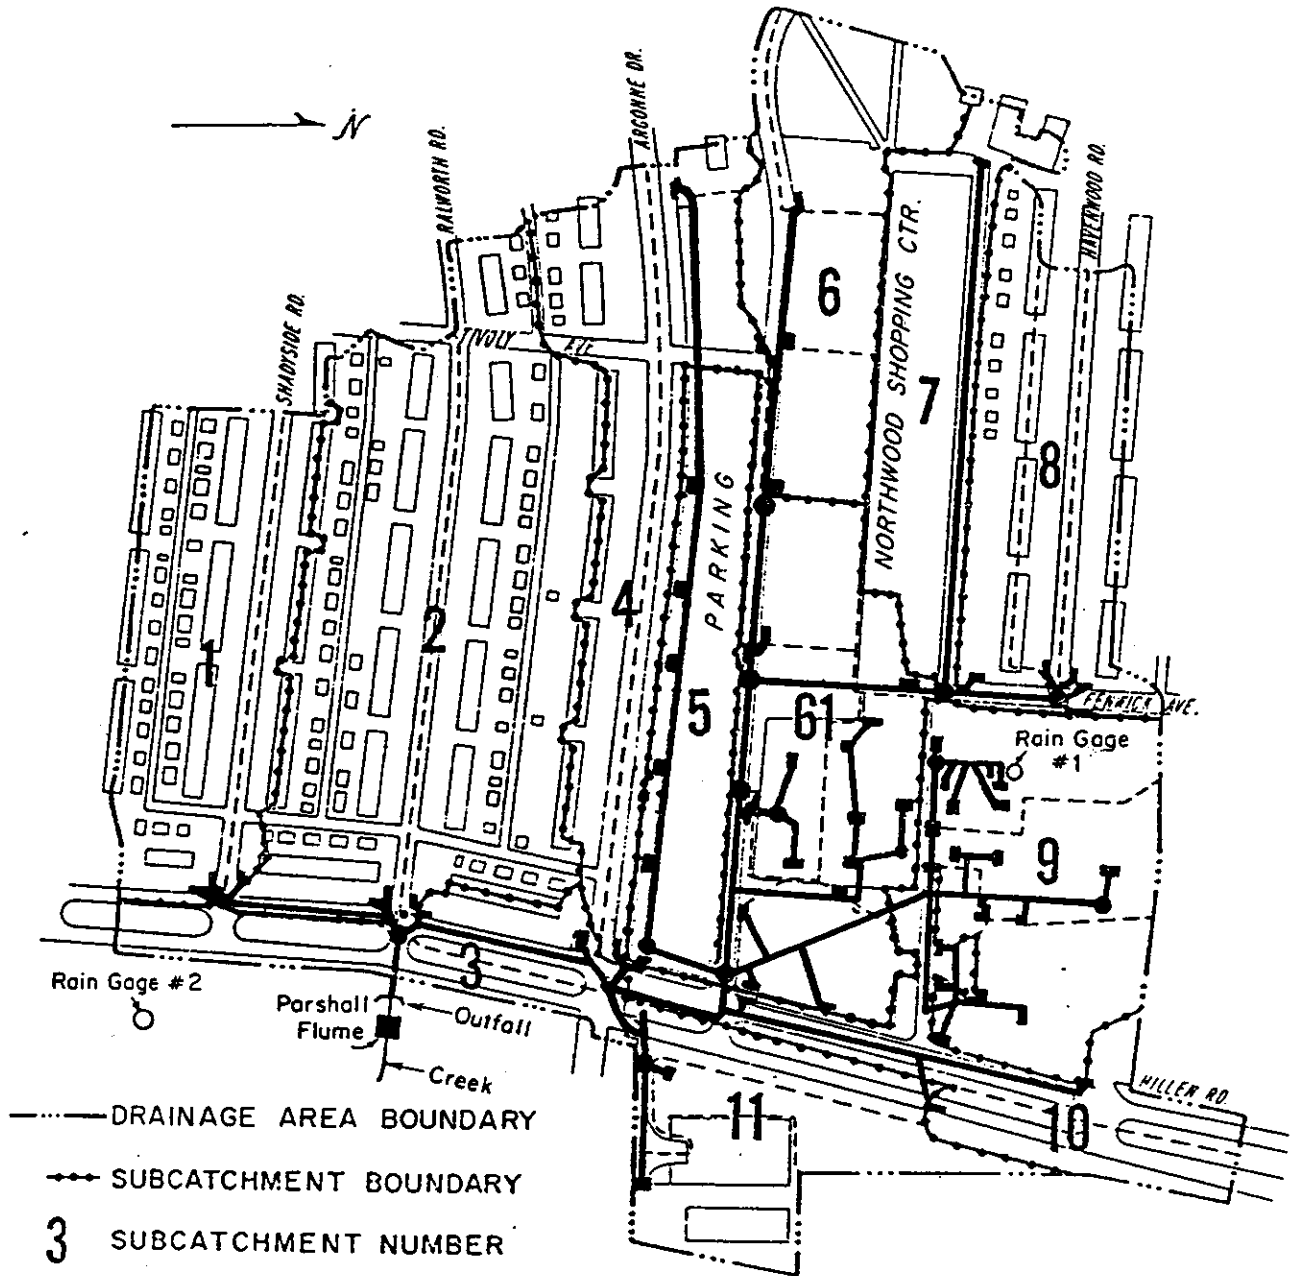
Northwood (Baltimore) Drainage Basin "Fine" Plan. (After Metcalf and Eddy et al., 1971a, p. 50)
